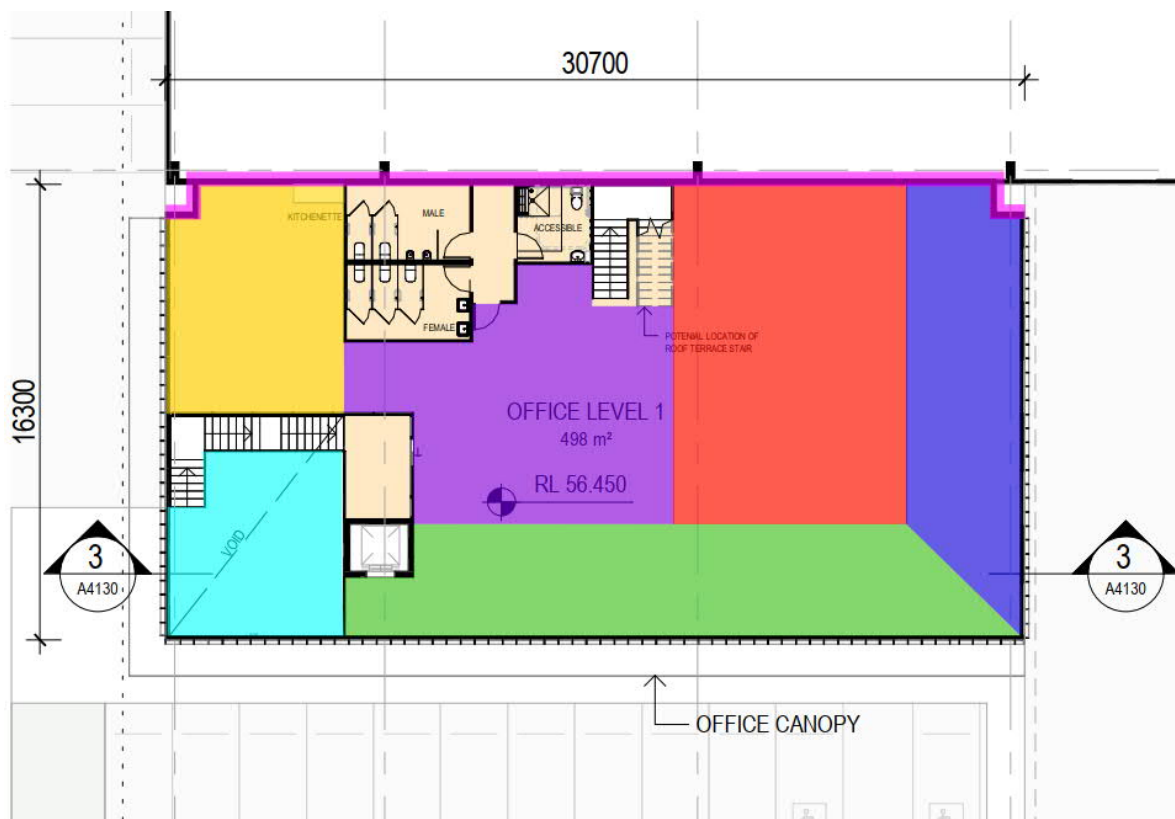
HVAC zones & thermal envelope for 5 McLaren Drive First Floor
